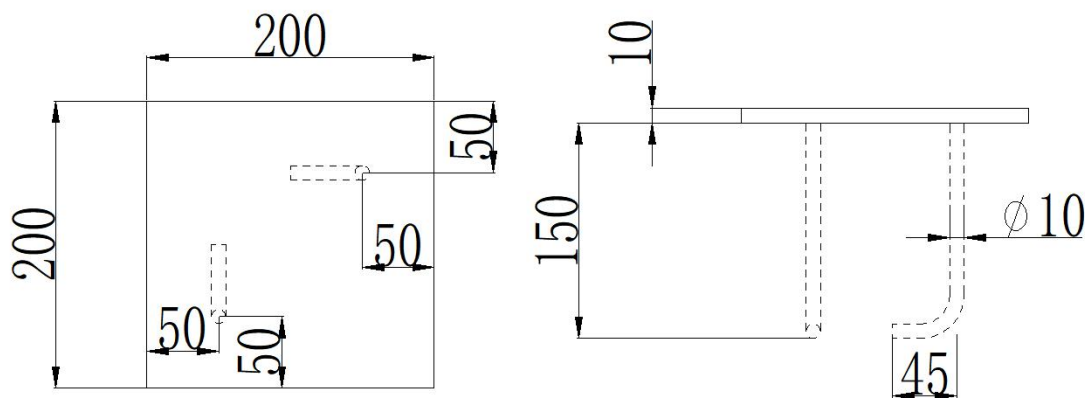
Iron Plate Size for Equipment Installation (unit: mm)
